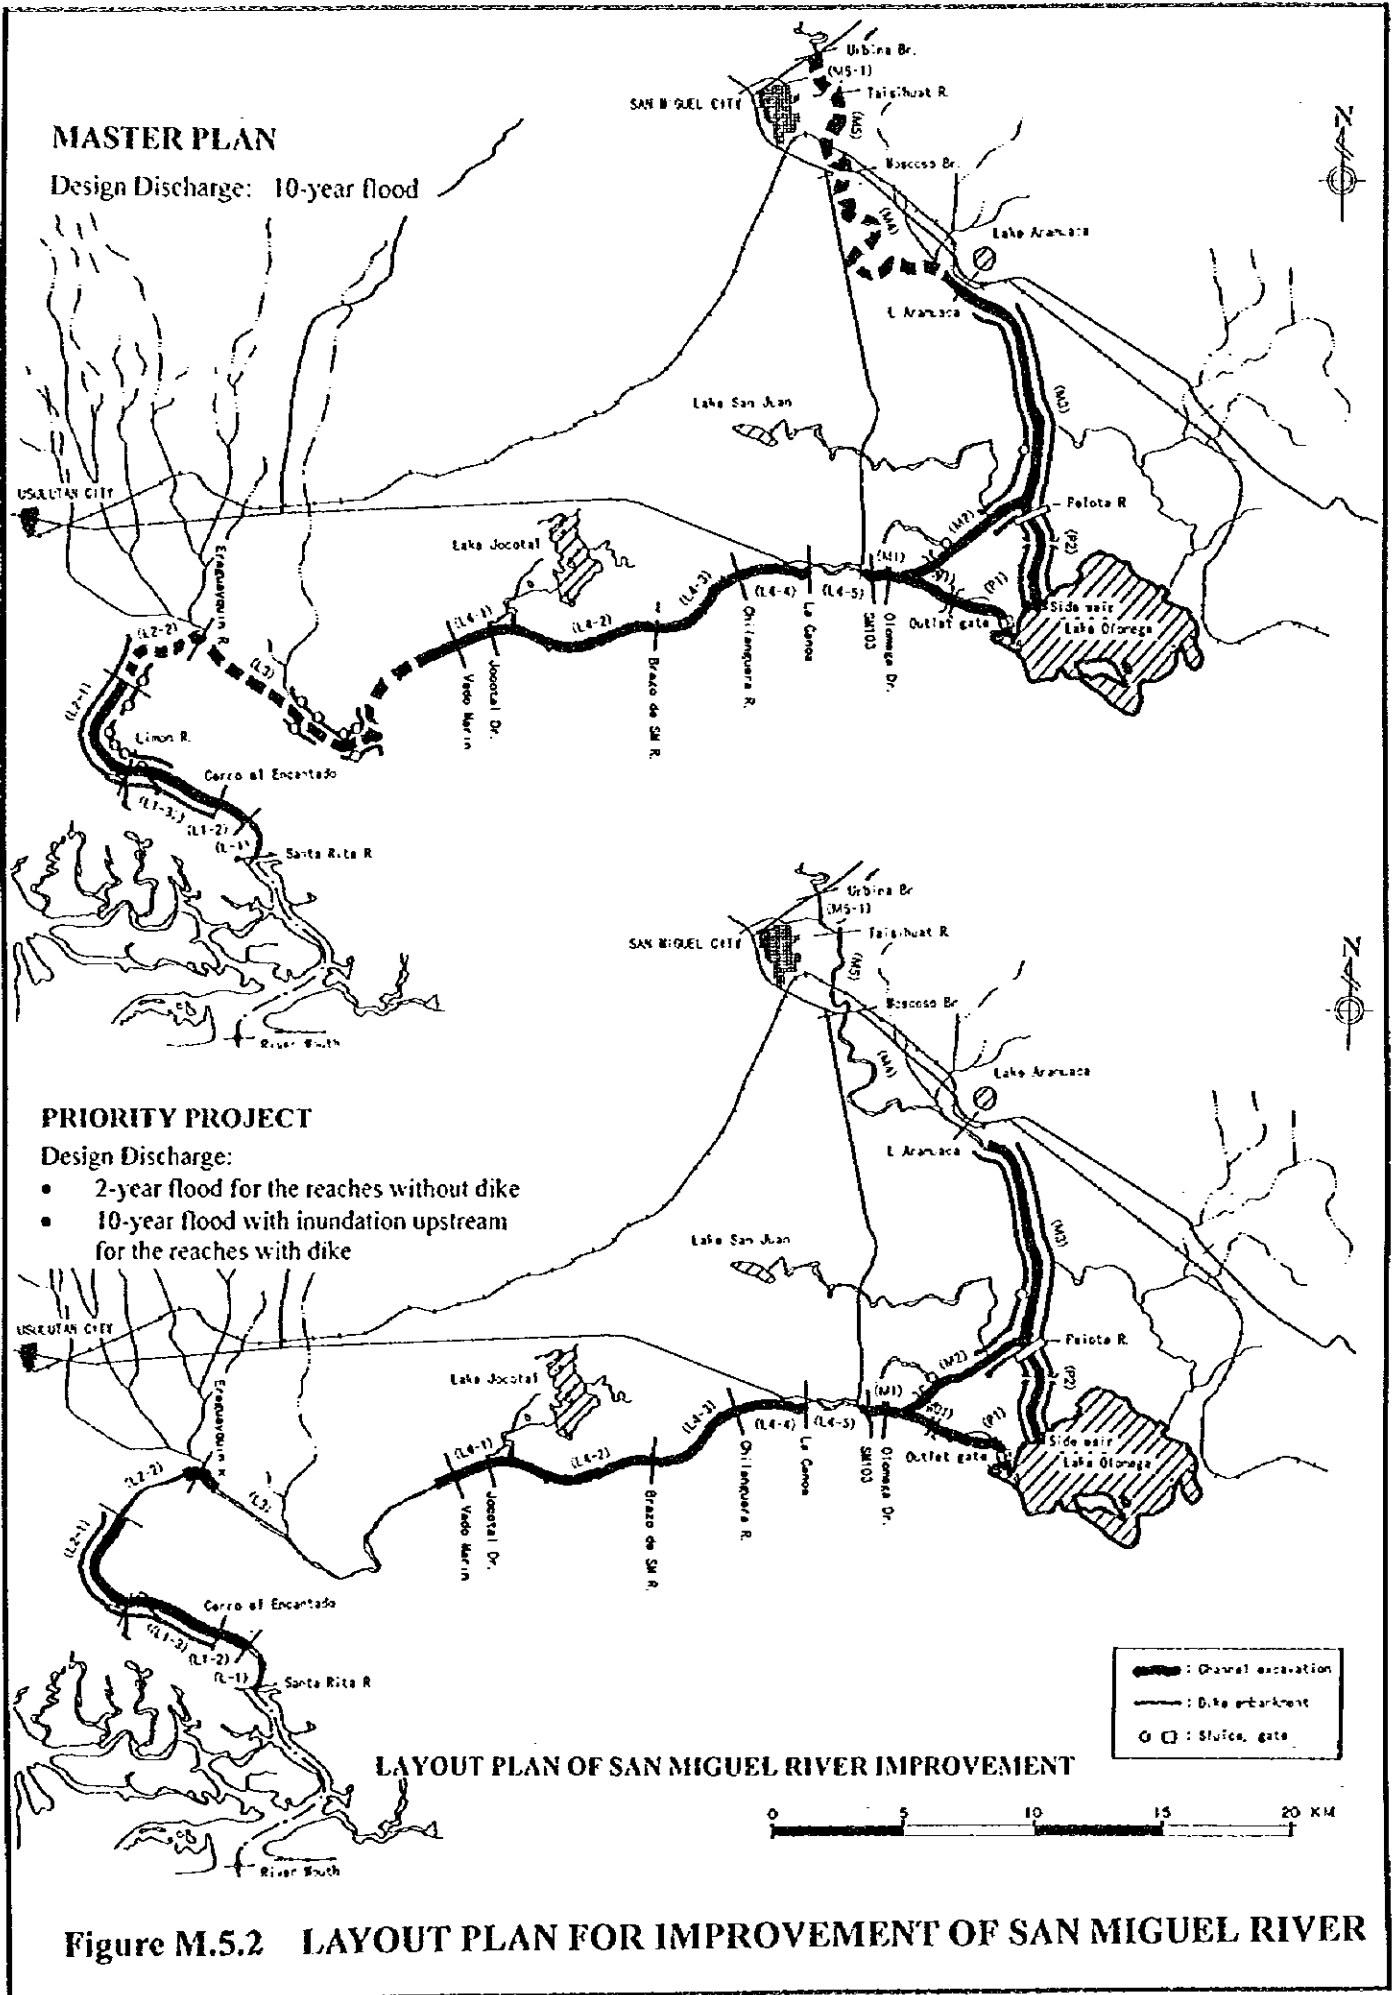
LAYOUT PLAN FOR IMPROVEMENT OF SAN MIGUEL RIVER
